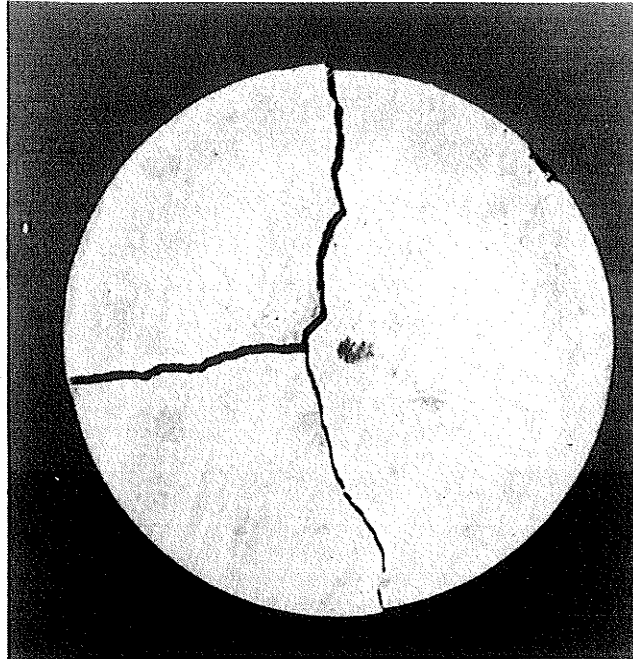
Cross-section of cracked specimen at end of test (Mix C specimen)
